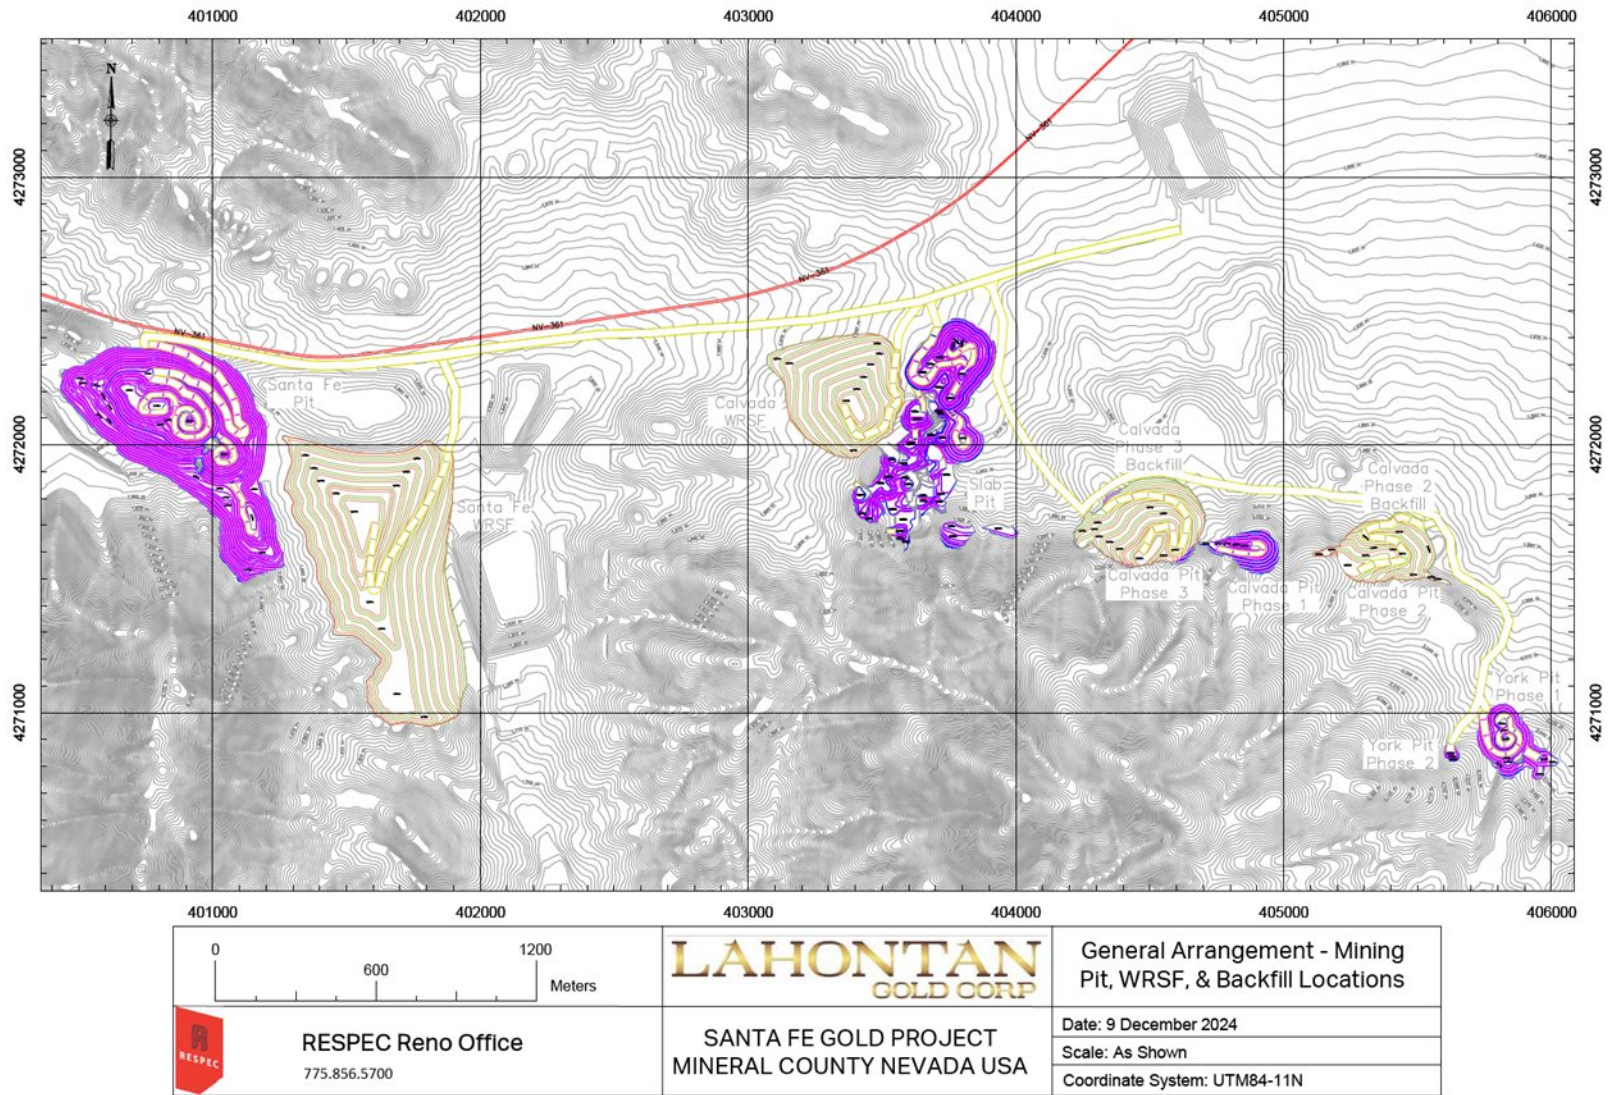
Mining General Arrangement – Pit, WRSF, and Backfill
